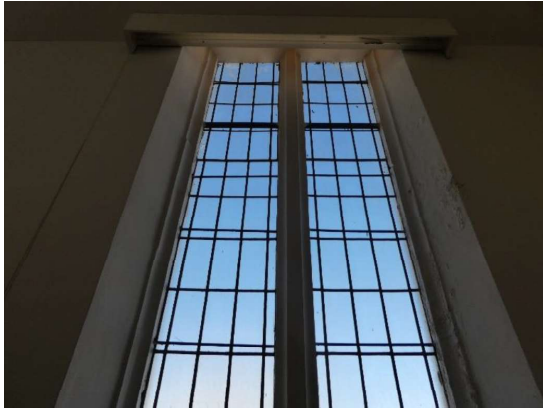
Showing the defective paint and plaster to the window sill on the southern wall.
